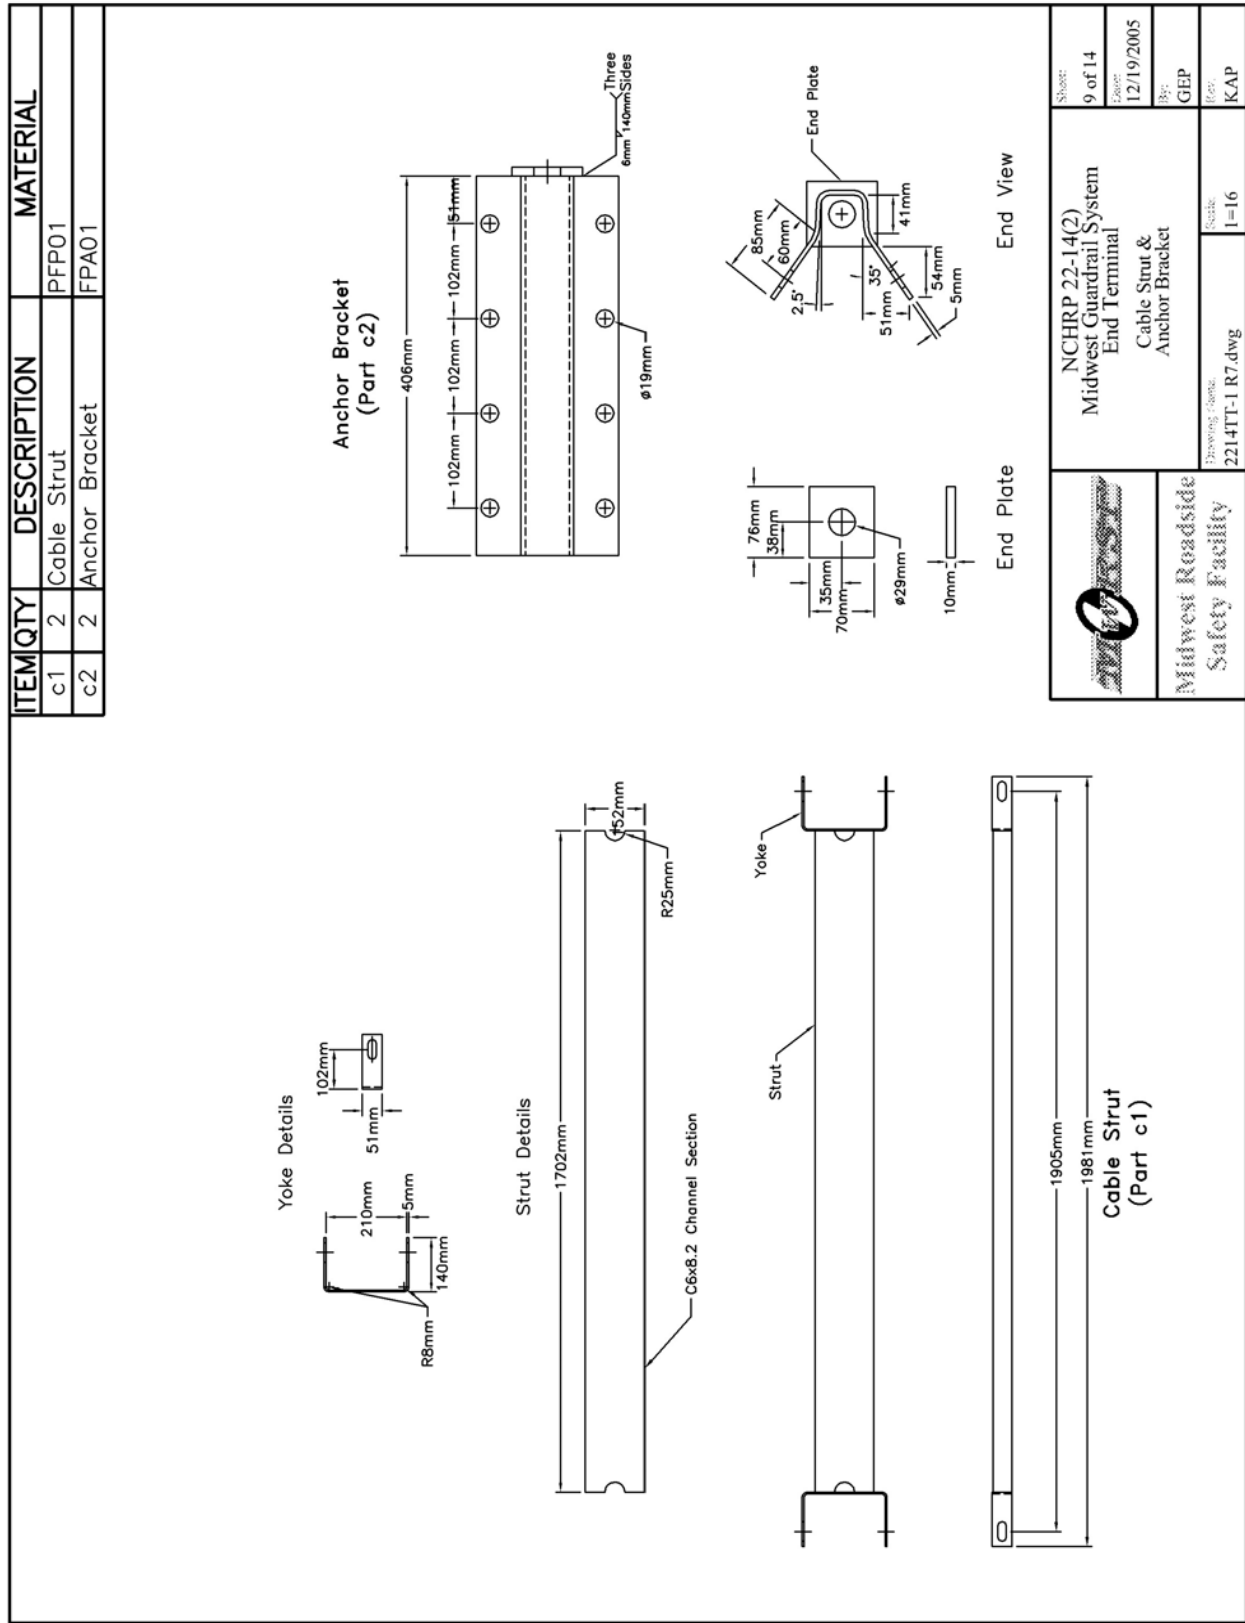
Midwest Guardrail System End Terminal - Anchorage Details
